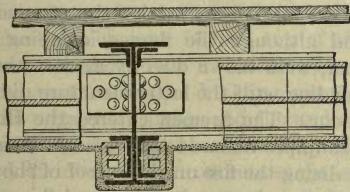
Floor Construction in Home Life Insurance Company's Building.
